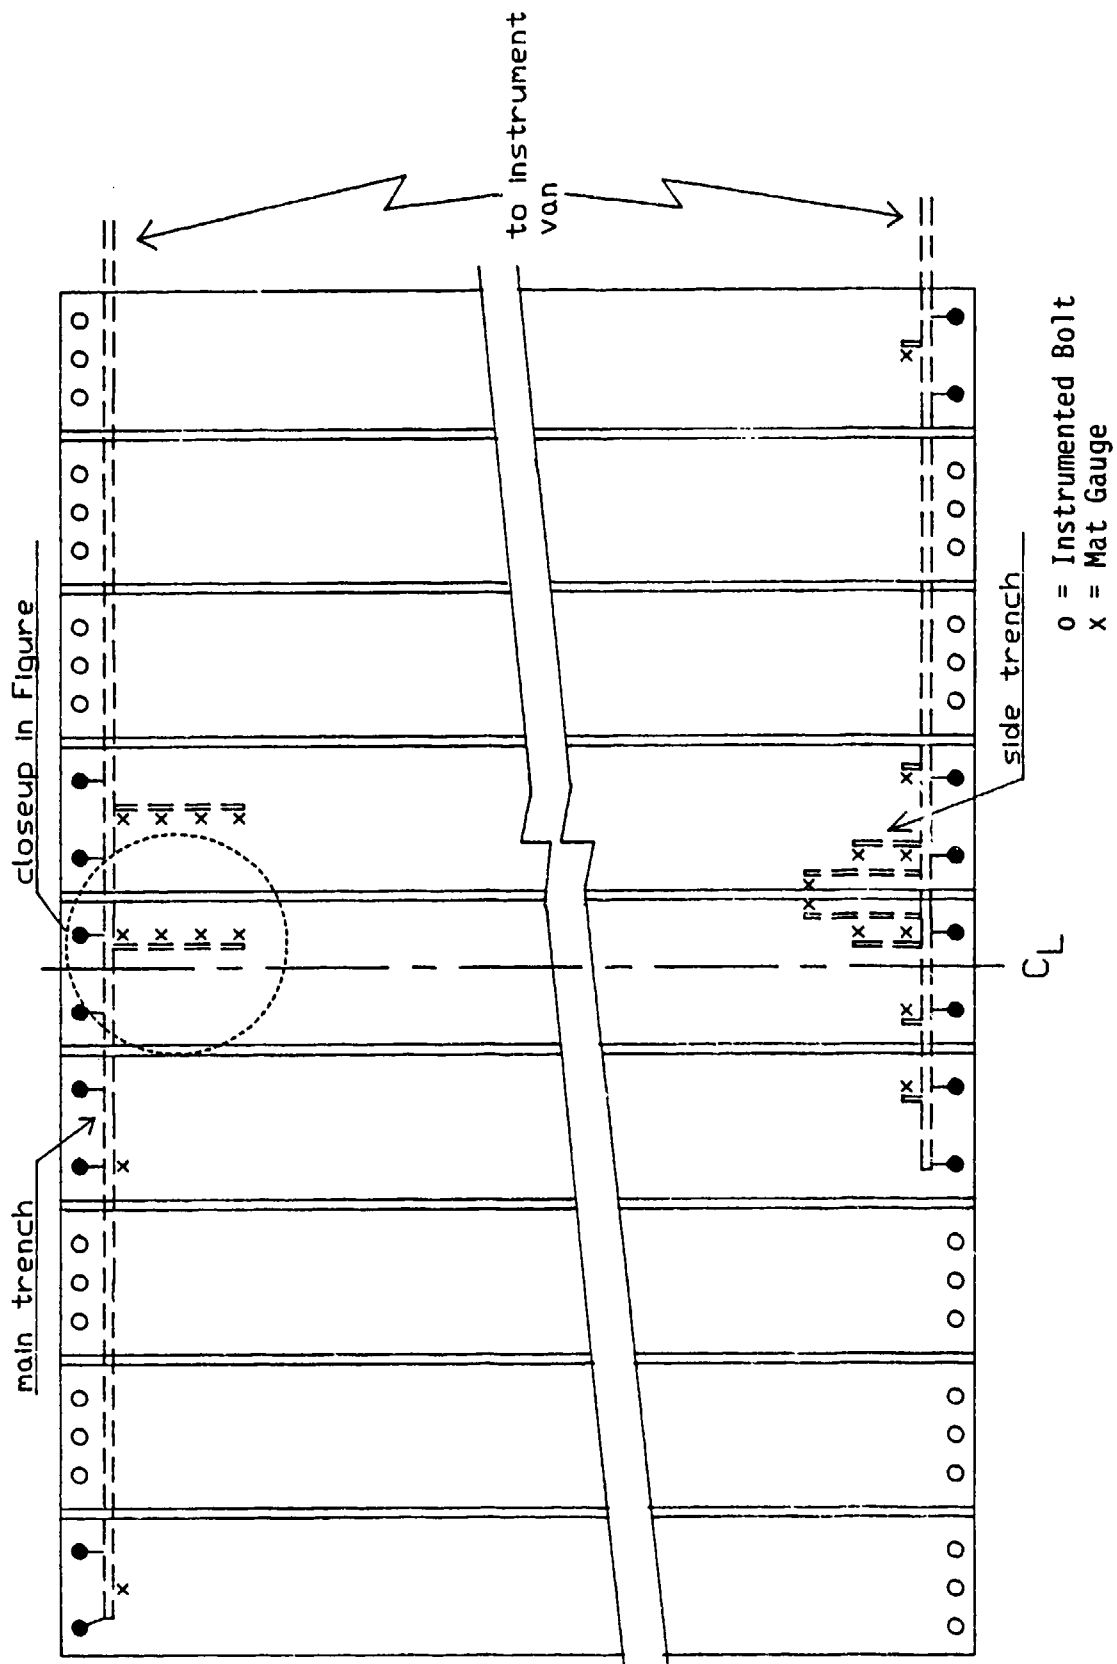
Layout of Instrumentation Wire Trenches Under Mat
